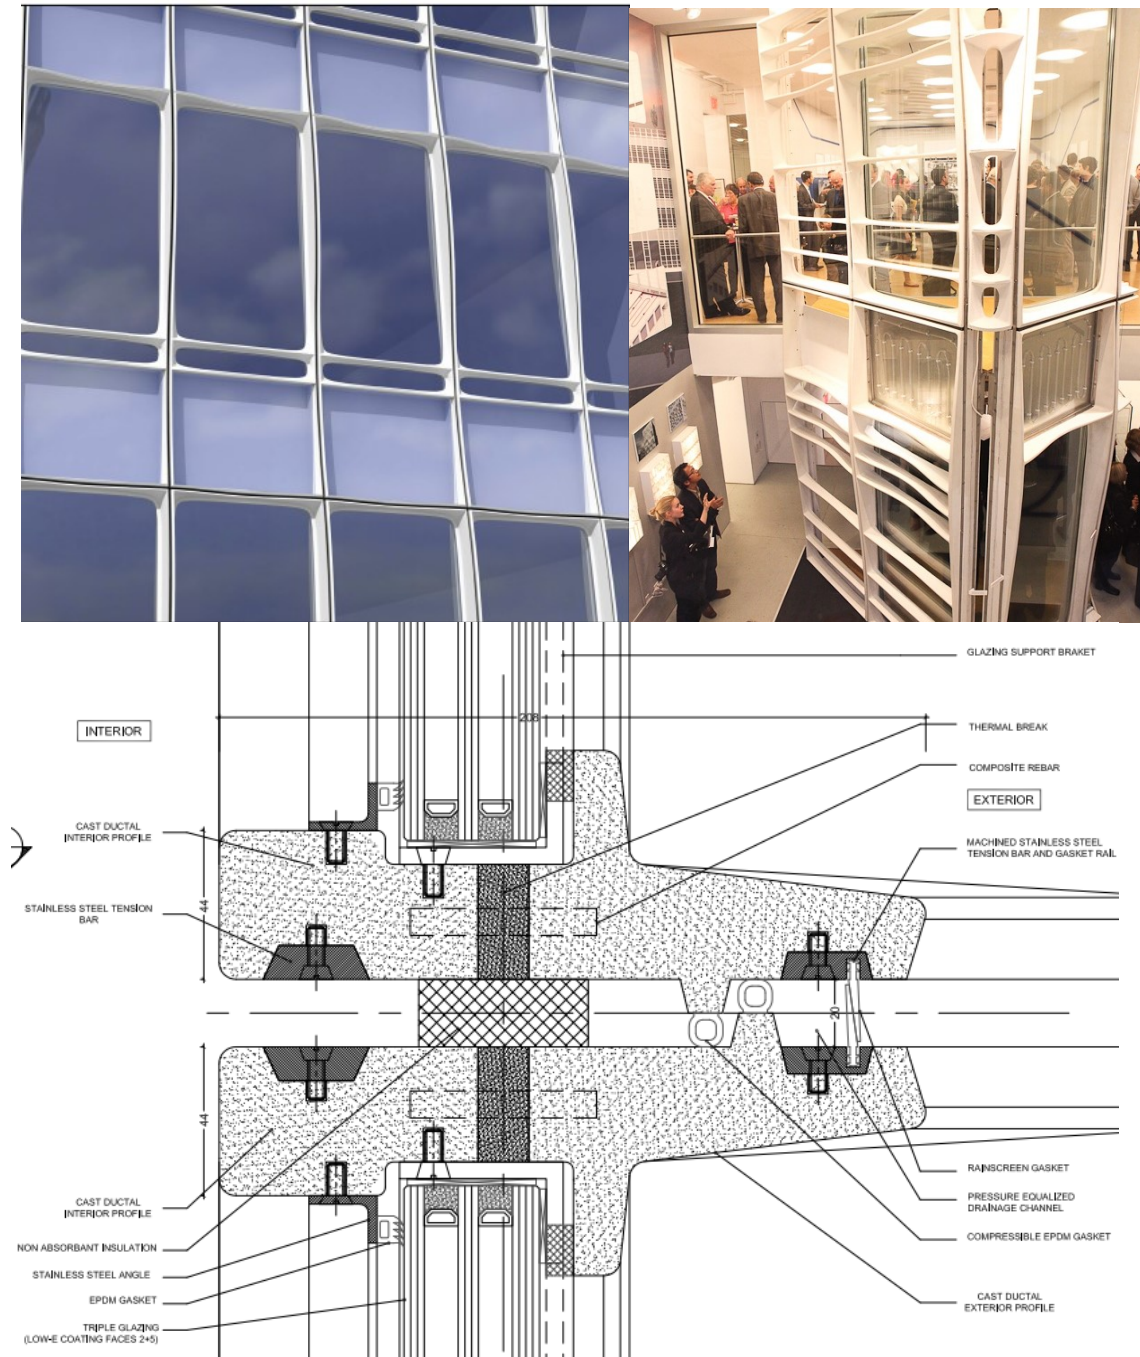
(left) Rendering of building façade with Liquid Wall, (right) Liquid Wall at AIA NY and (bottom) UHPC mullion detail protecting against weather, water, thermal, vapor, and air penetration creating a complete curtain wall solution [Images RFR Consulting Engineers, Peter Arbour [2] and Lafarge]
